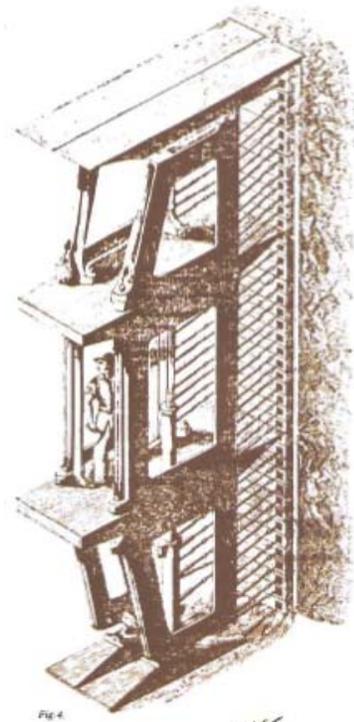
Above, Shipworms collected from mangroves used to prepare Tamilok. Left, the Thames Tunnel, constructed 1825-43, was where shield-tunneling was invented by Sir Marc Isambard Brunel.
